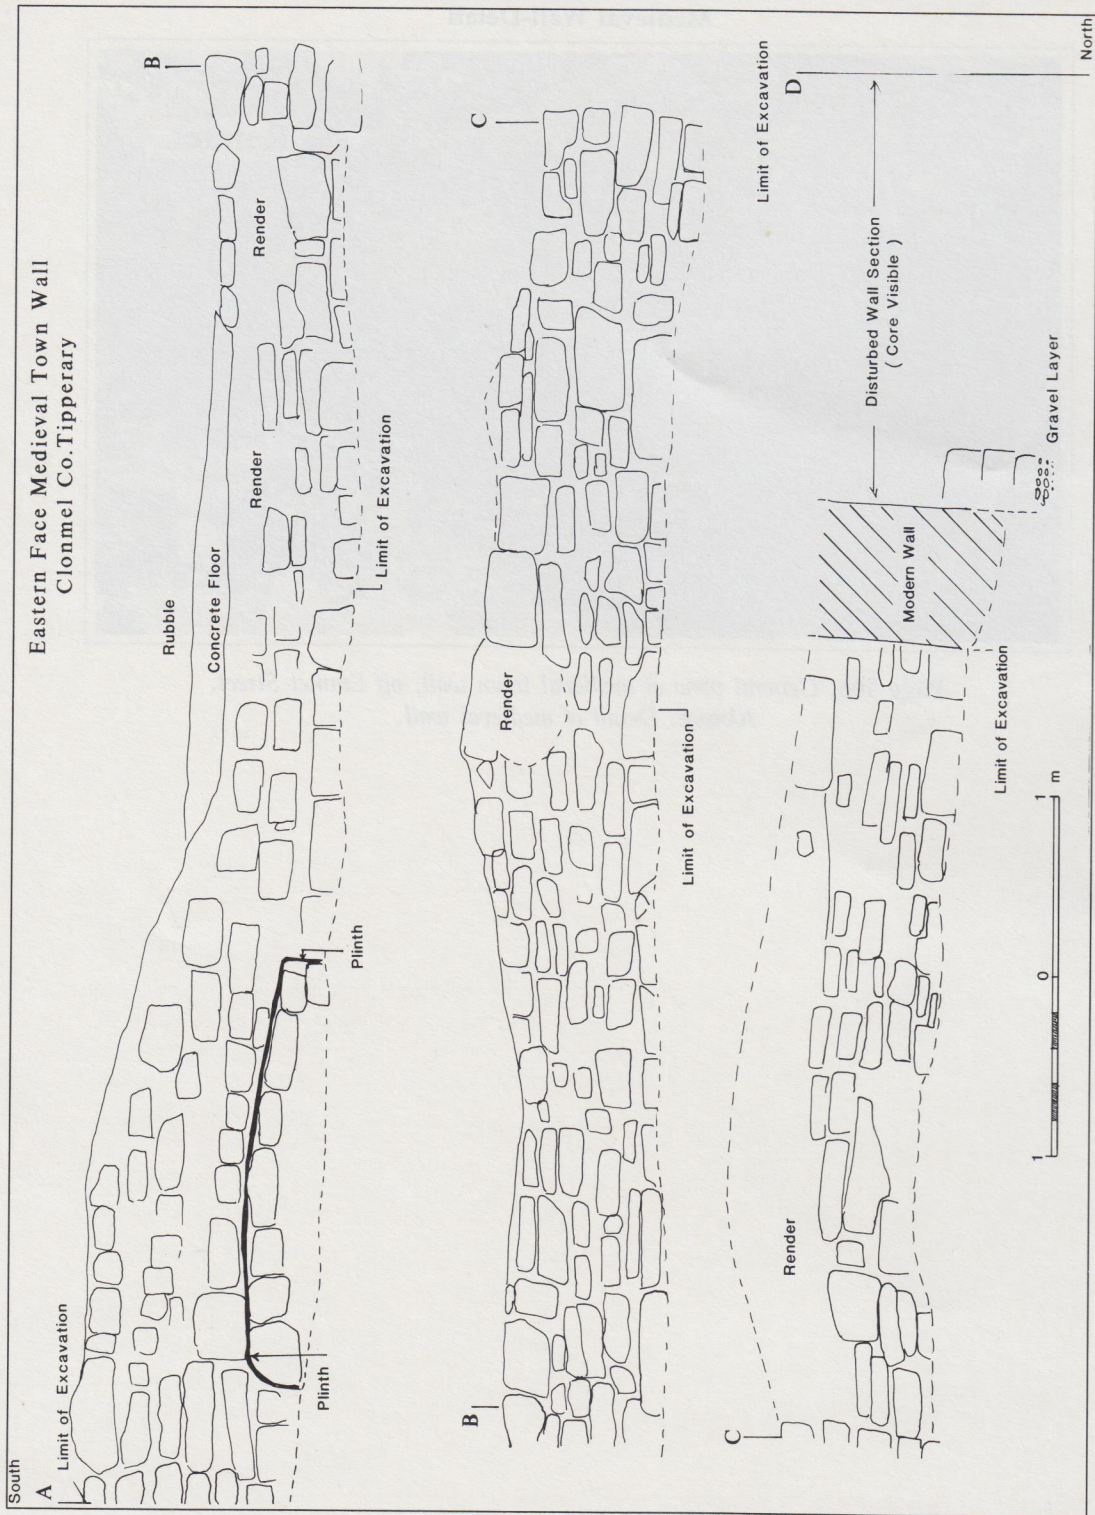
Elevation of exposed section of medieval wall off Emmet Street, Clonmel.
